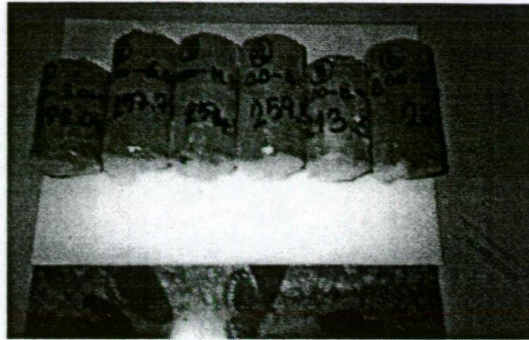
Coring for testing Unconfined Compressive Strength (Kasem and Pinit, 1998)
